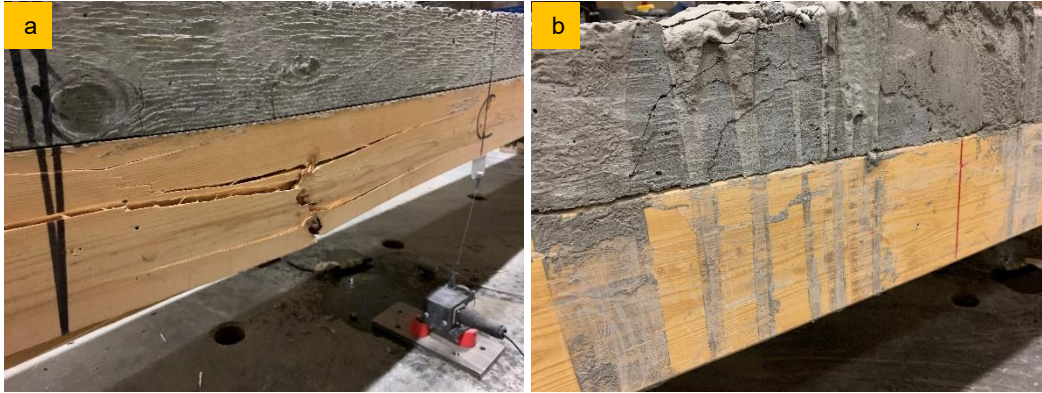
a) Timber fracture and b) concrete crack in tension zone; in specimen (#9) GLT4.5-C100-I5-30°-S250
